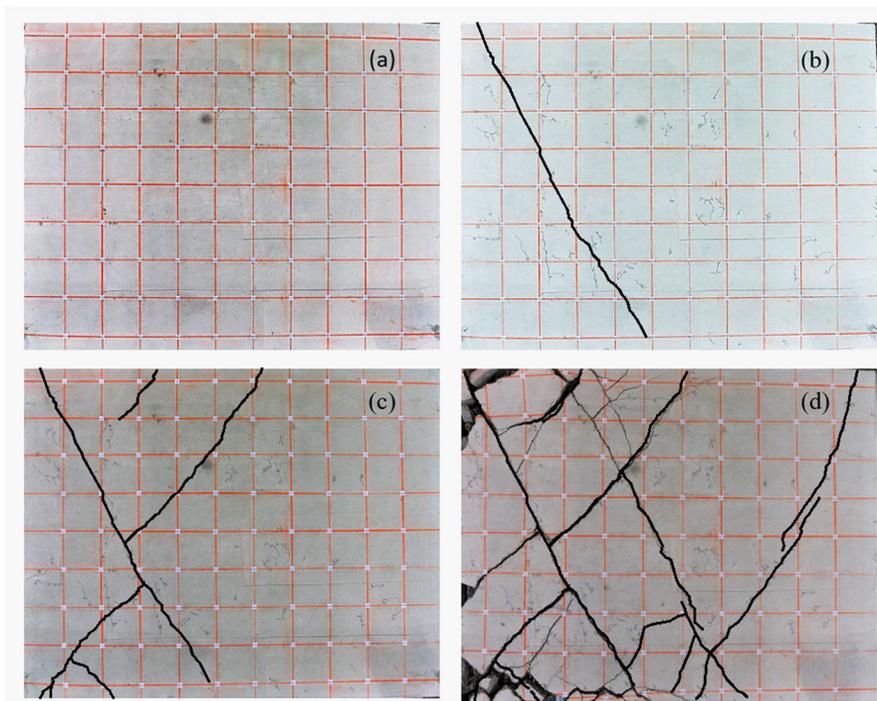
Progression of failure for specimen 3/7.5-4-N-NF-DT. (a) Before testing. (b) First appearance of diagonal tension cracking. (c) First appearance of diagonal tension cracking in opposite direction. (d) Crack pattern past failure
